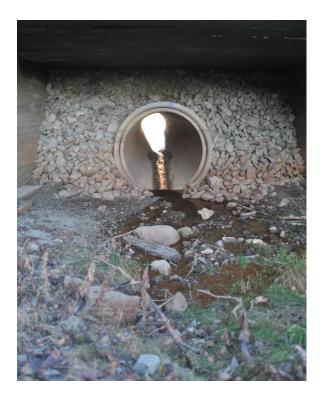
Culvert at conservation area Lamyra. Looking to Storelva. Picture taken on 05.12.2018
